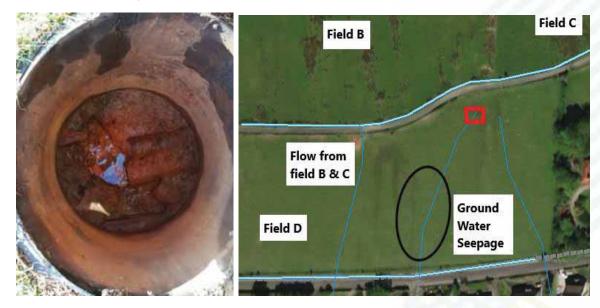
Open pit showing change in construction from 300mm Ø twinwall PPE to 225mm Ø VC pipe - possible previous blockage location
